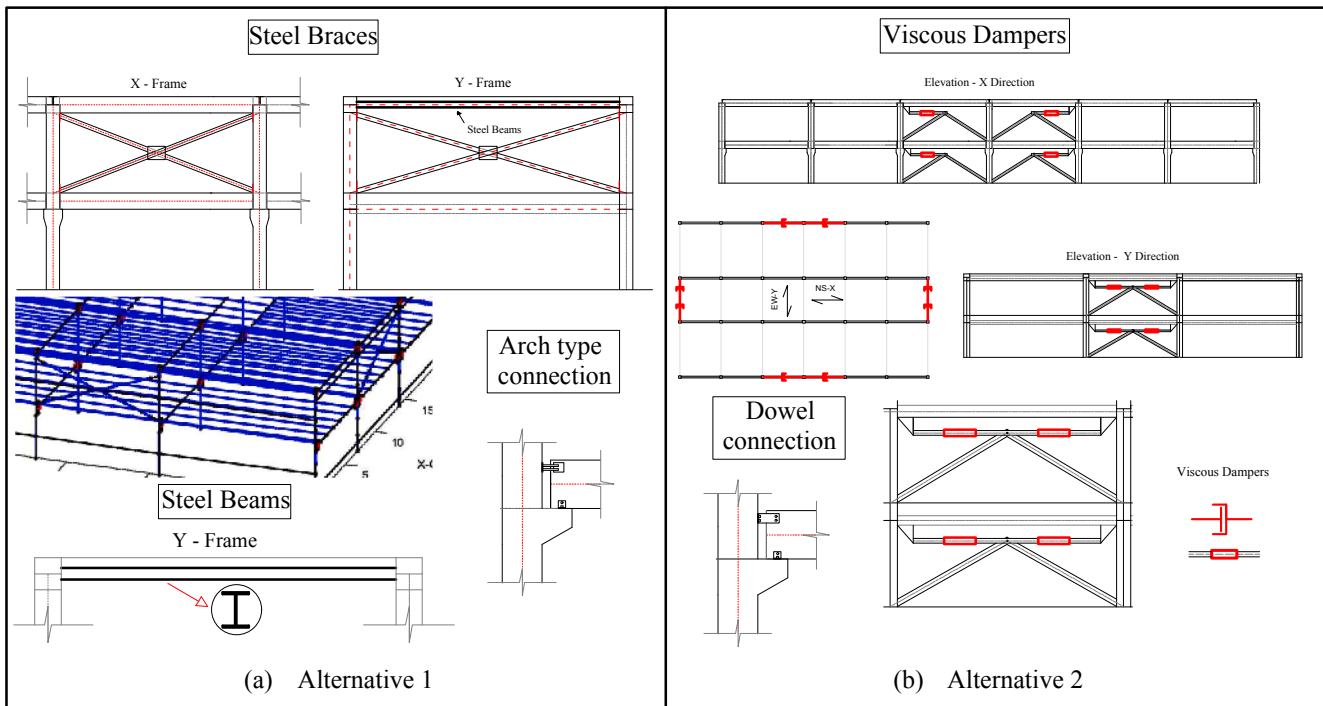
Illustration of retrofit alternatives for the PC case study school building where (a) Alternative 1 incorporates steel braces and improved connections in the beam-column joints and (b) Alternative 2 incorporates viscous dampers and improved connections in the beam-column joints.
